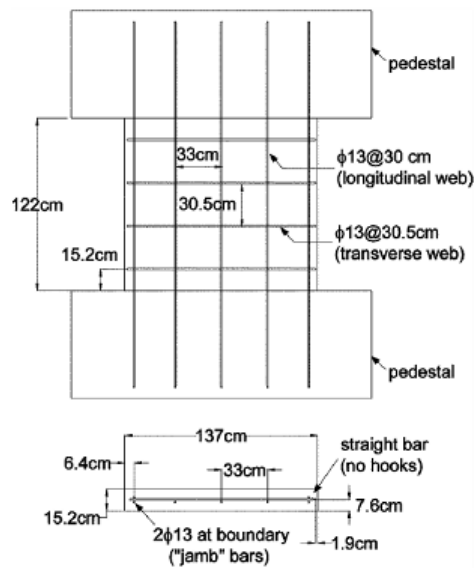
Geometry and Steel Reinforcement for Wall Piers (Massone *et al.*, 2009).
